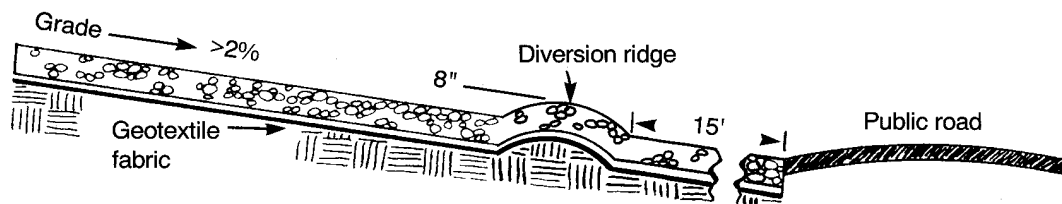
Cross-section of a Construction Entrance/Exit (NC, 1993)
